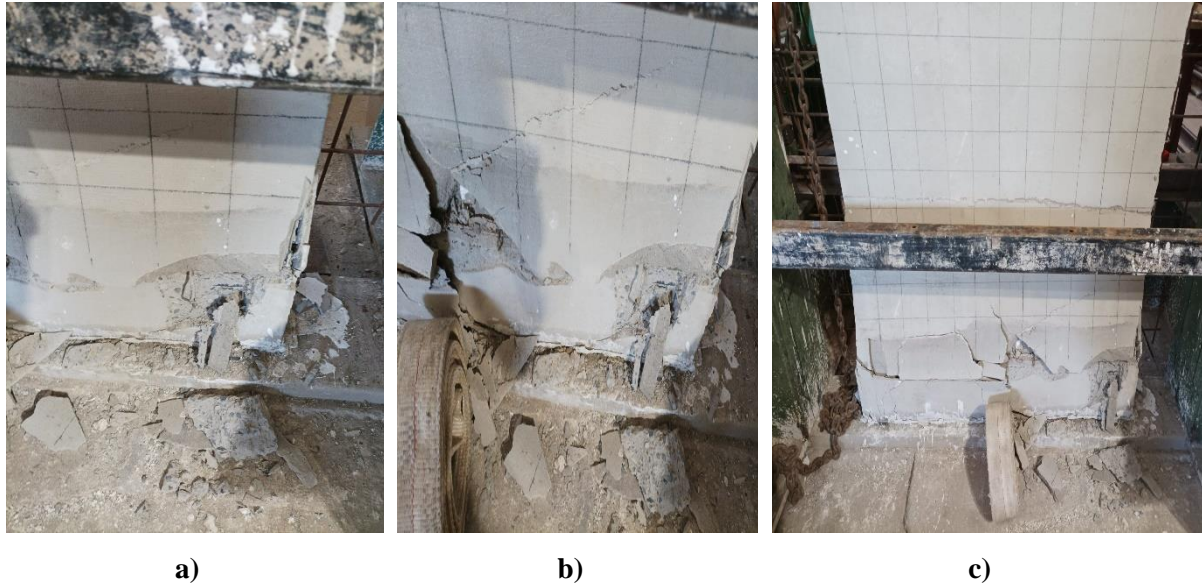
16 - Failure mode of panel PA2: a) and b) crushed concrete beam at bottom; c) horizontal crack formed after failure.
